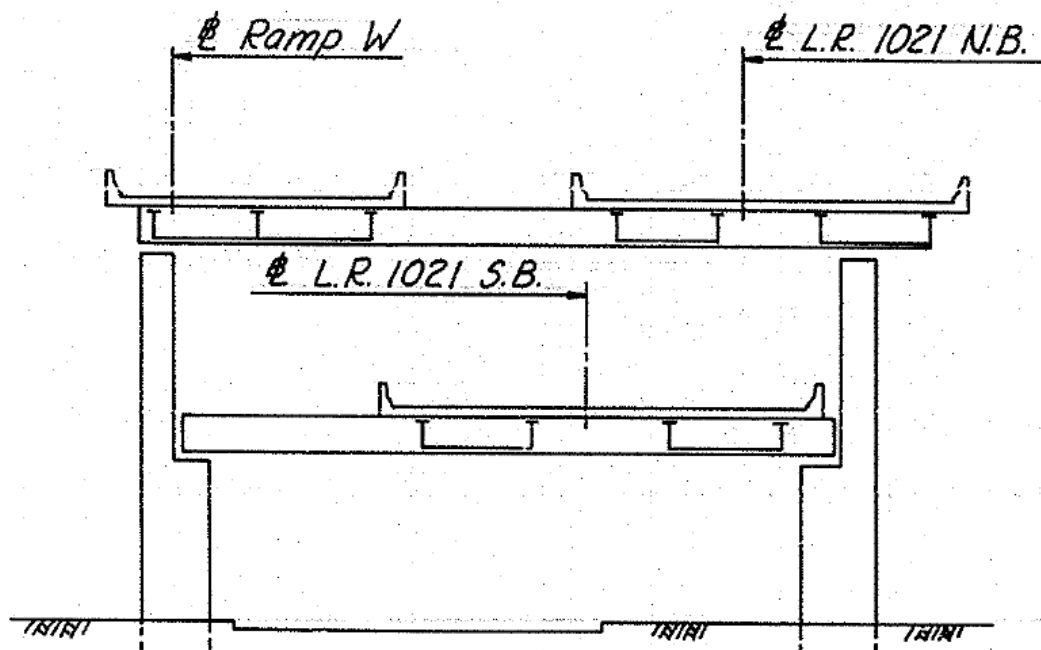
Example of Cross Girders and Piers Supporting Multiple Superstructures
